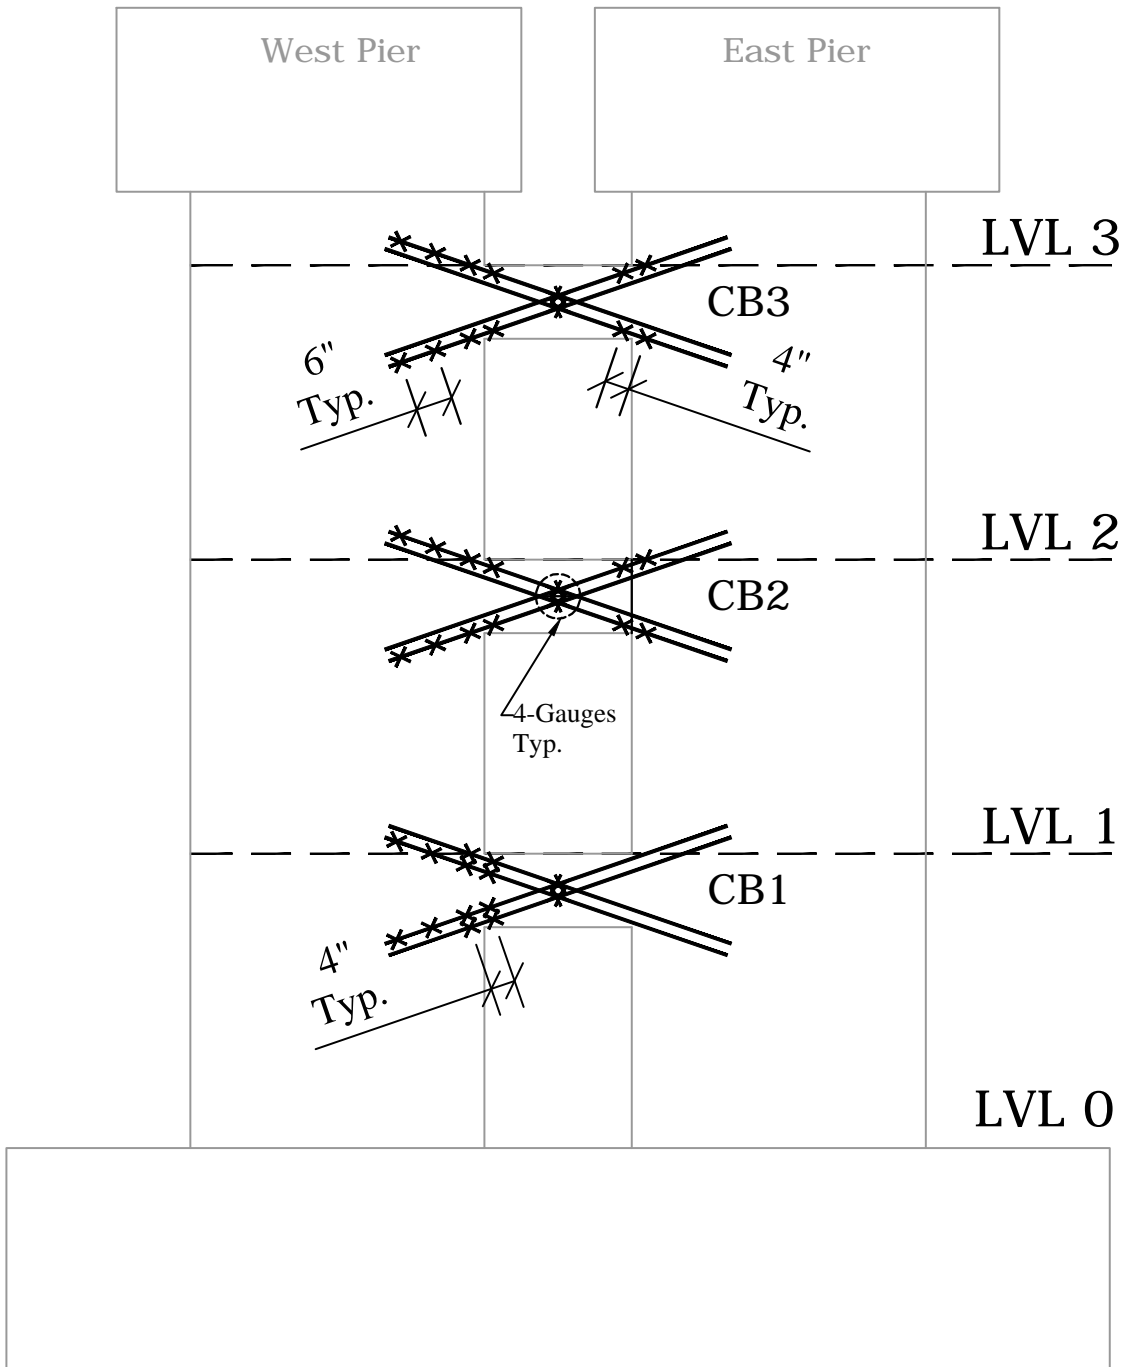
Coupling beam diagonal bar strain gauge layout
